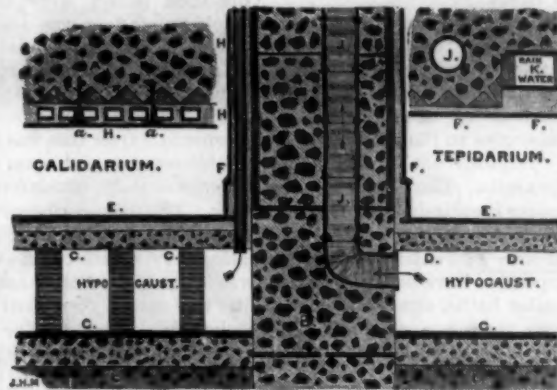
SECTION THROUGH THE FLOORS AND WALLS OF THE BATHS OF CARACALLA.
